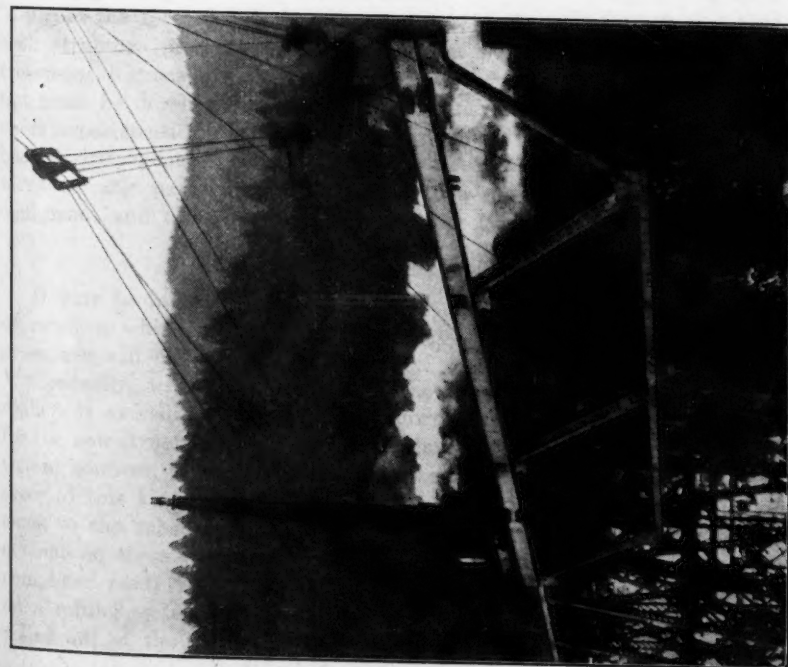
ERECTING TRUSS WITH CABLEWAYS; LOCOMOTIVE CRANE IN BACKGROUND SUPPORTING ONE END OF TRUSS.
